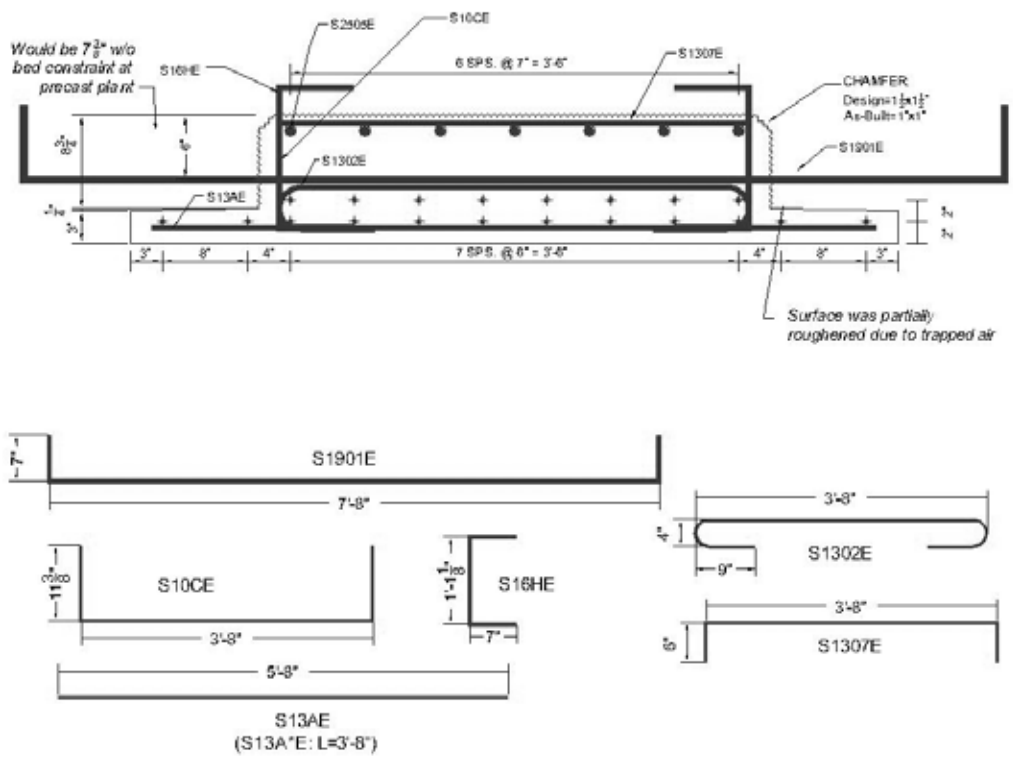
As-built cross section and reinforcement details for the west end of Beam 1N
